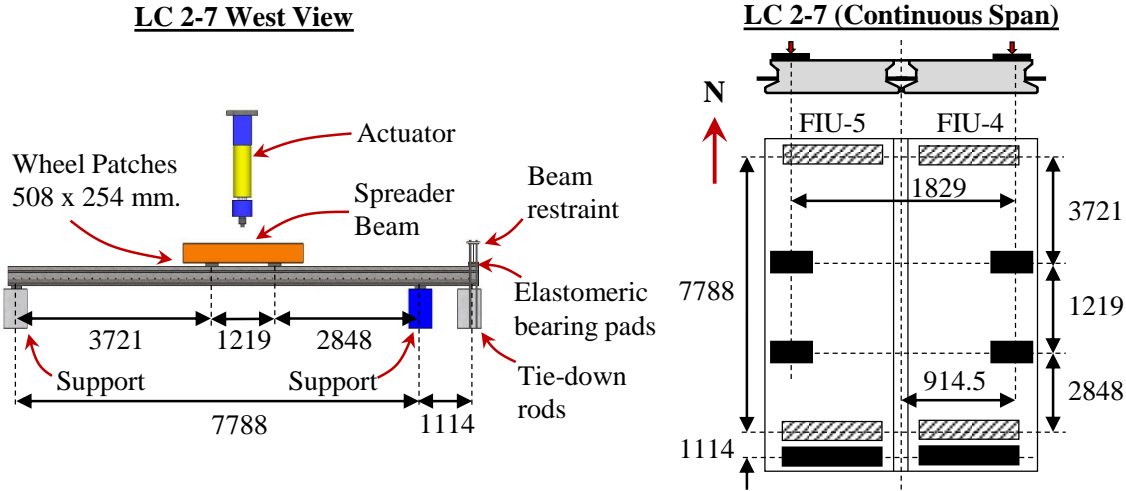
Testing frame layout for LC 2-7 (continuous span) (units: mm, 1 mm = 0.0394 in.)
